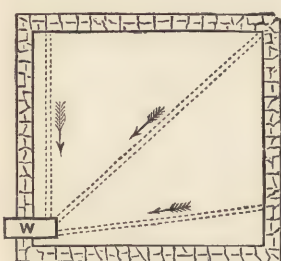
Plan of Underground Ice Vault—W, Well under wall; dotted lines, Drains to Well.
